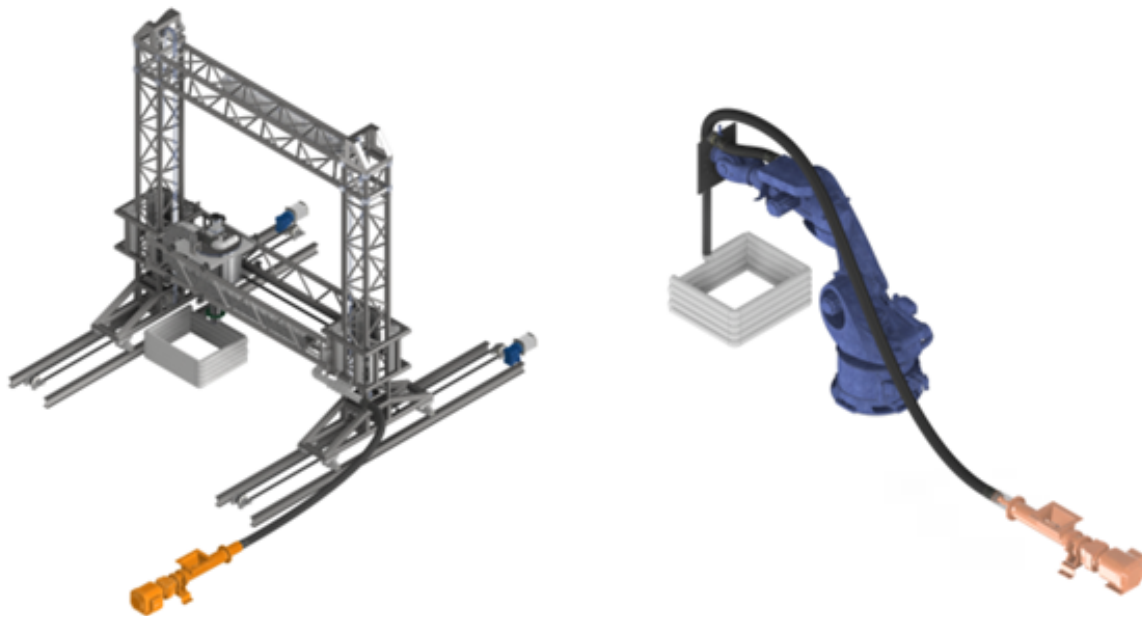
Most used 3D printing Systems. (a) Illustration of a mobile frame 3D printing system. (b) Illustration of a robotic arm 3D printing system.
